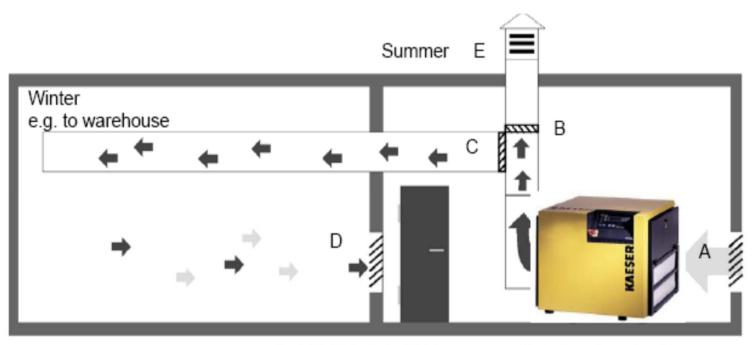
Air ducted outside in summer and to heat warehouse in winter
